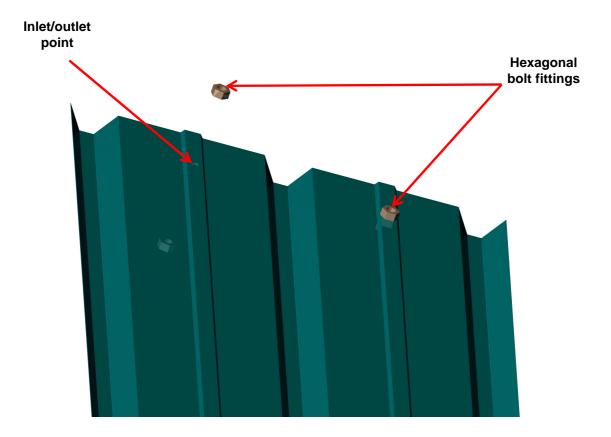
Mounting fittings to corrugated sheet underside at inlet and outlet points.
